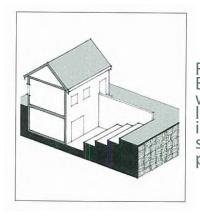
Excavated walkouts similar to the one illustrated here shall not be permitted.
